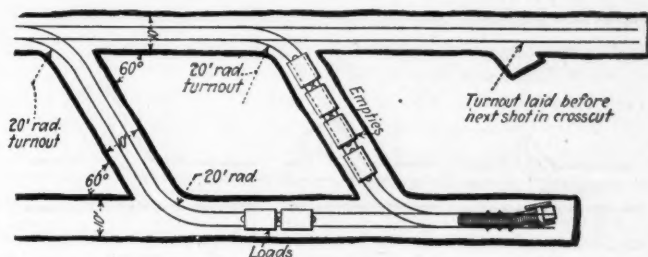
PLATE II. TRACK LAYOUT FOR ENTRY DRIVING
